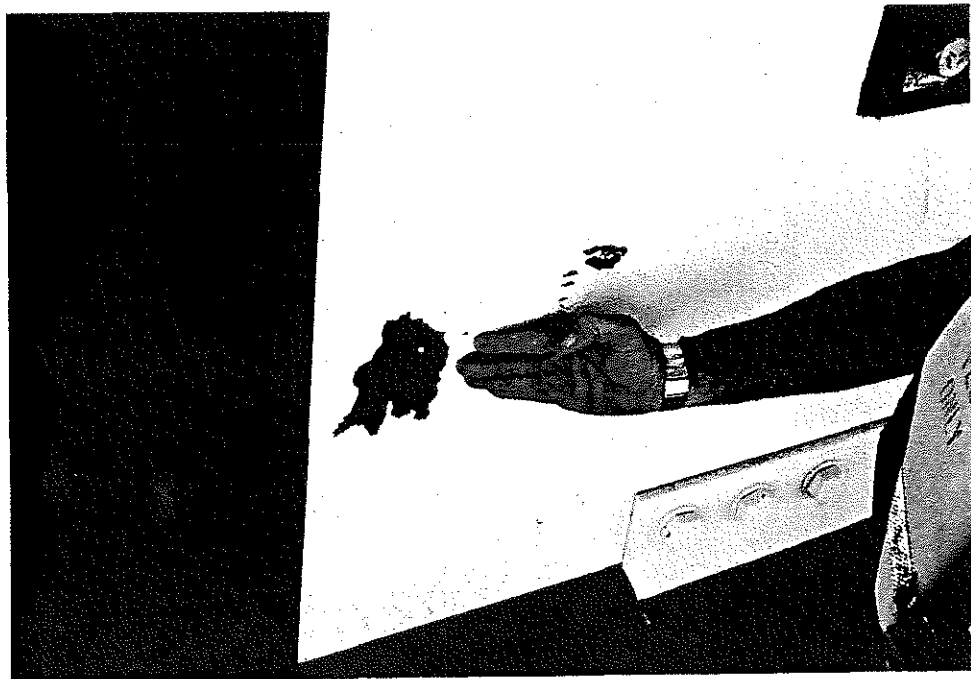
Coating Failure on New Construction Steel on the US 27 Bridge at Covington (1993).
